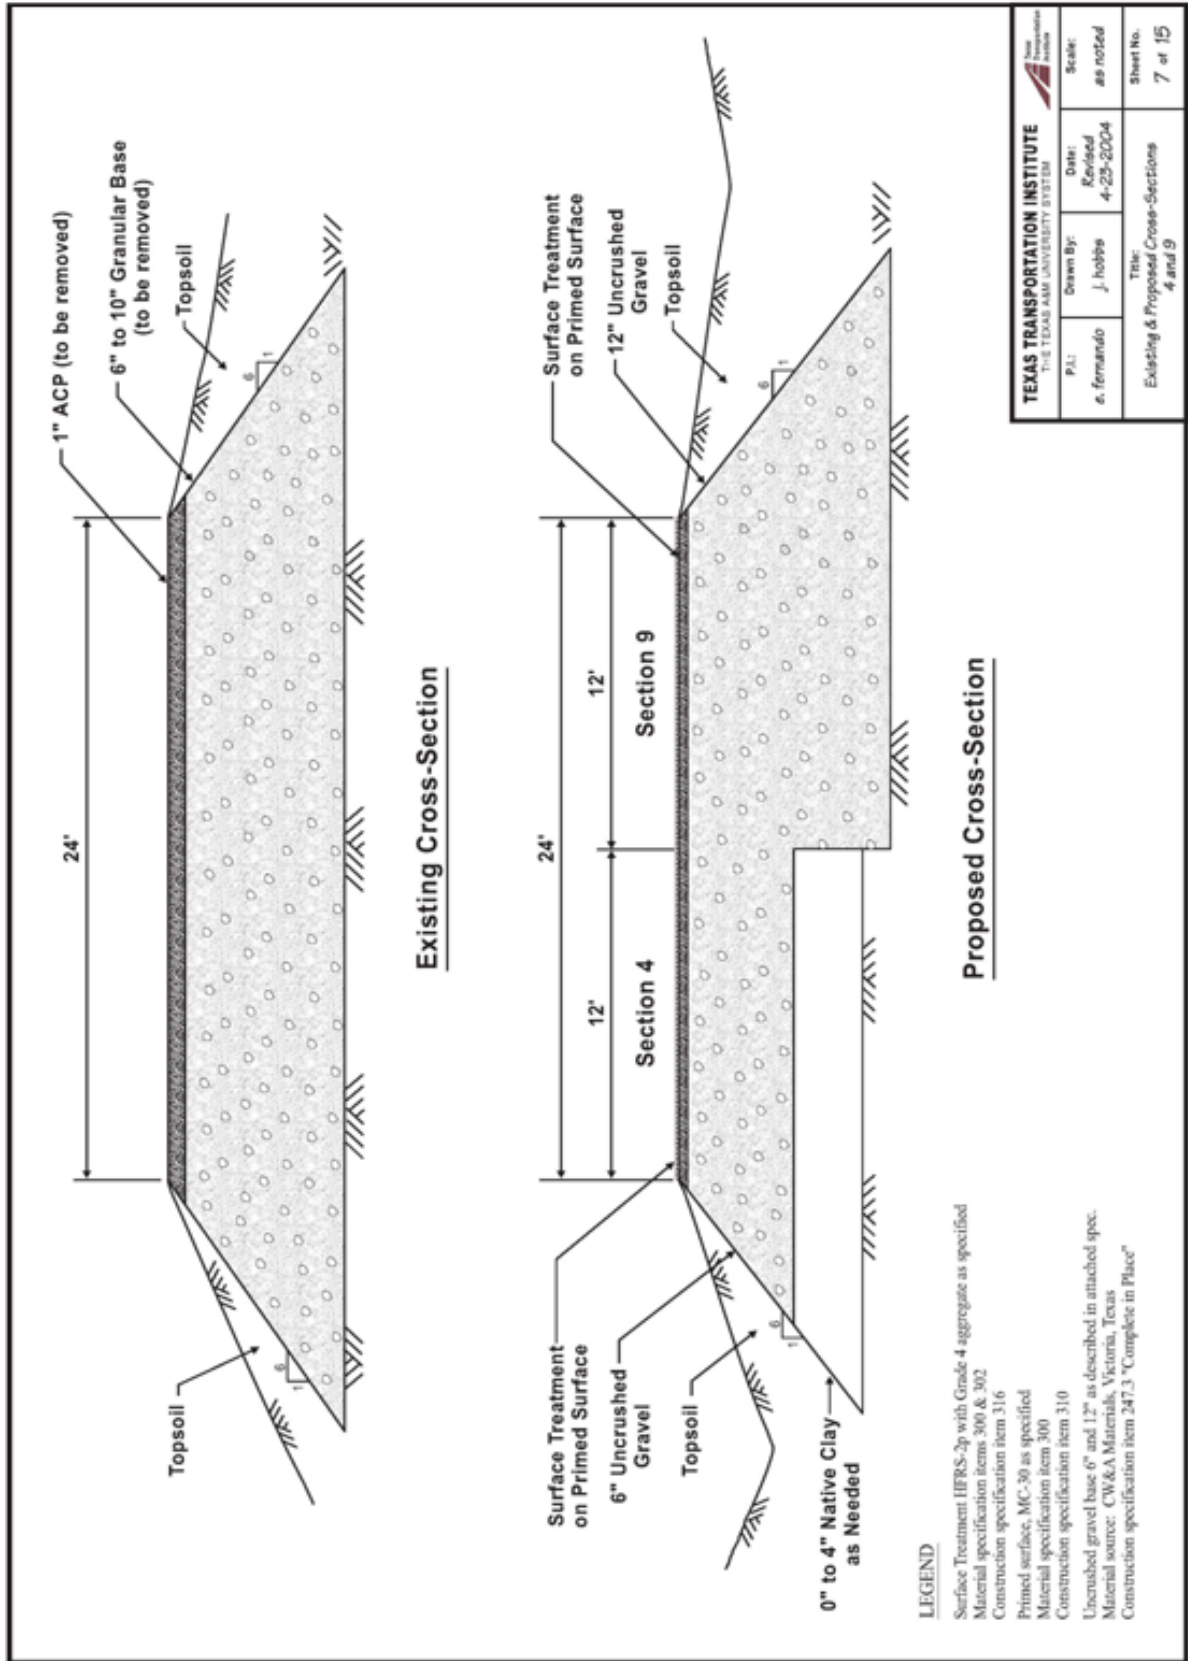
Existing and Proposed Cross-Sections for Sections 4 and 9.
